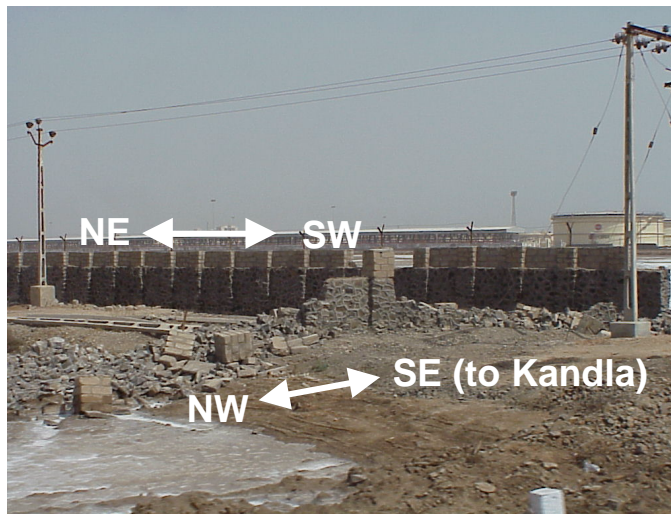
Collapsed stone wall on road to Kandla Port, indicating acceleration to the northeast was strong enough to collapse one wall to the southwest
